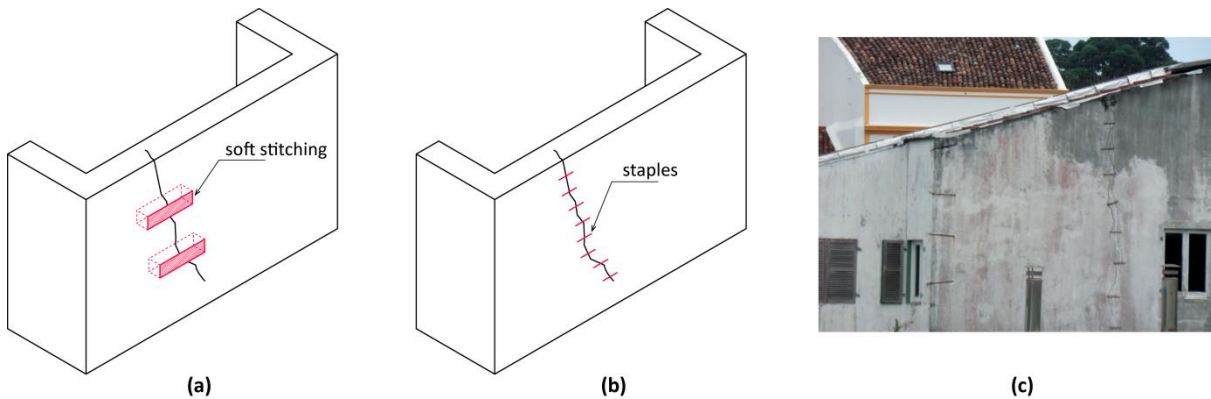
(a) soft stitching, characteristic of rammed earth constructions; (b) use of staples, characteristic of masonry constructions; and (c) example of mended cracks in Azores, Portugal (photo by Mariana Correia 2013)
